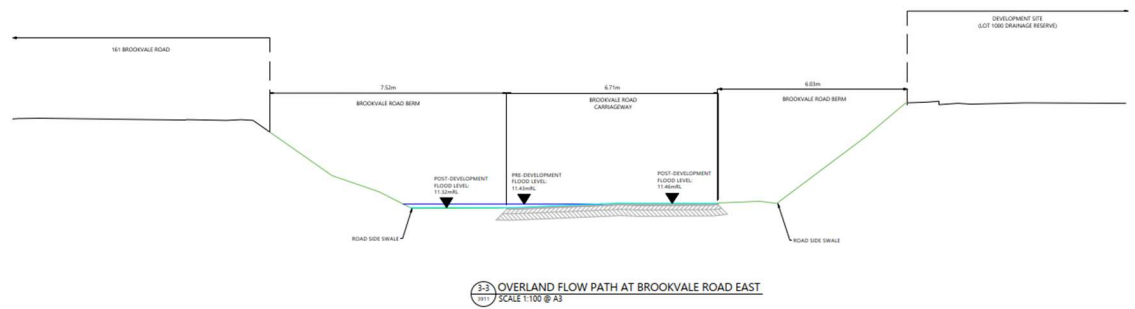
Water surface elevation - Cross sections along Brookvale Road
